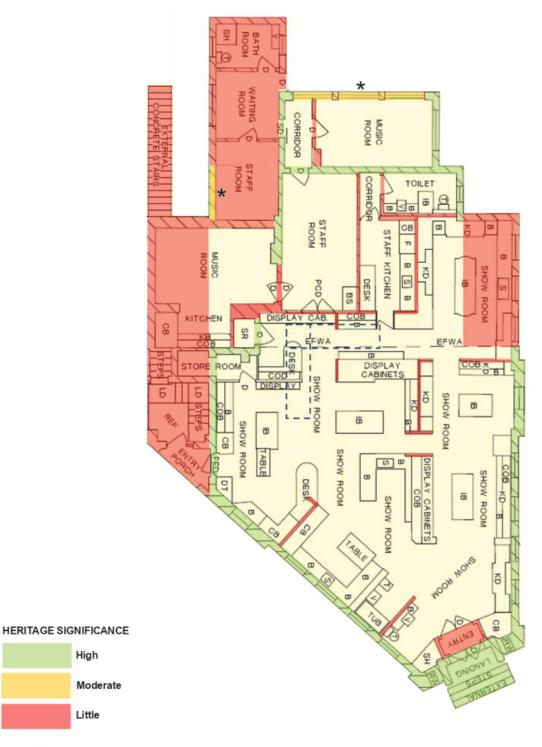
Gradings of heritage significance, Ground Floor. Blue dashed lines: erstwhile internal staircase. Not shown: Garage, graded as Moderate. Base plan: Geometra Consulting
